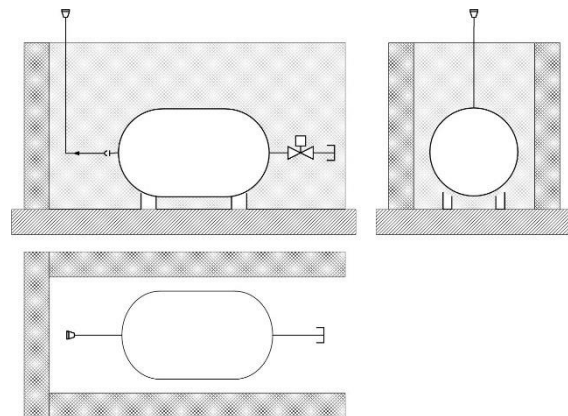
Typical small-scale hydrogen storage schematic with fire wall
